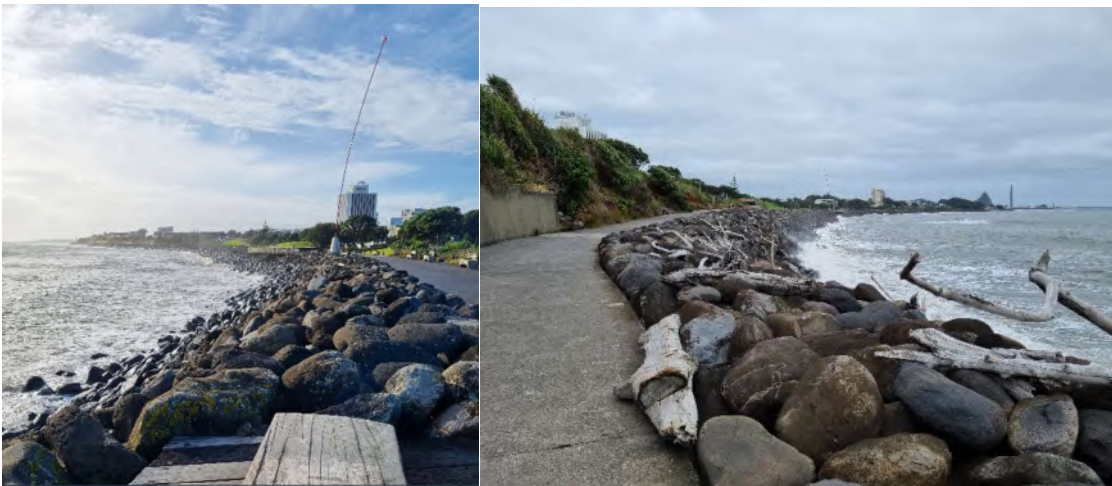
New Plymouth Foreshore rock rip rap seawall, June 2023 (left) and June 2024 (right)
